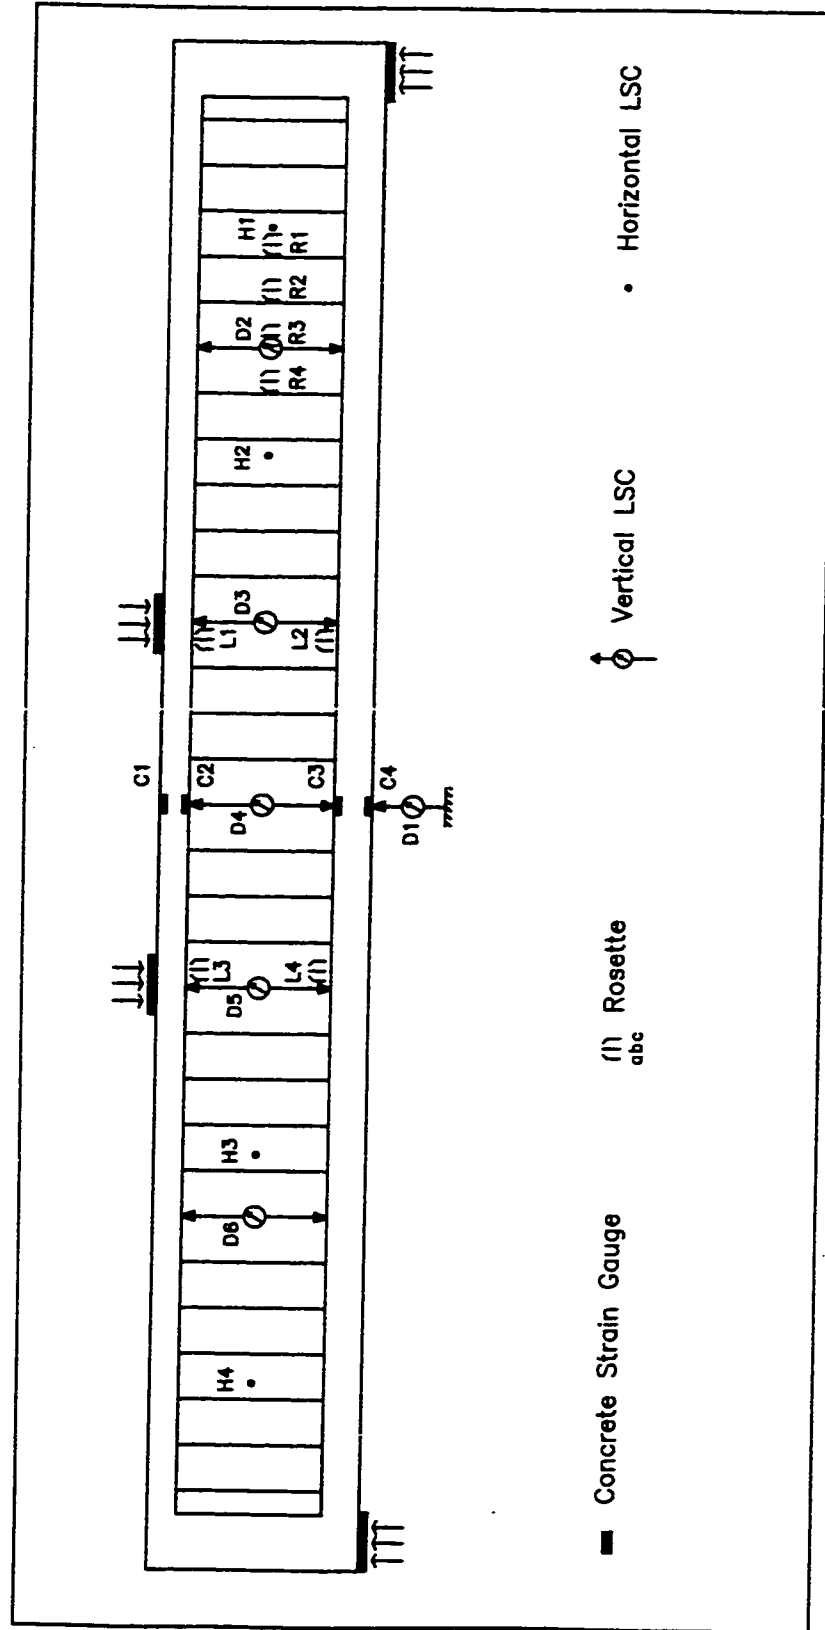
Instrumentation details, girders A-175, A-110, and A-80
